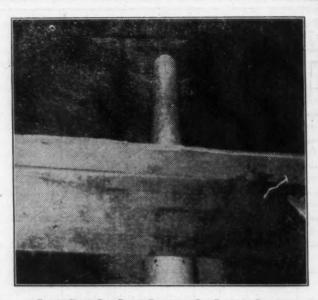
Drain Pipe Placed Below the Slip Plane to Correct the Crolona Heights Landslide
